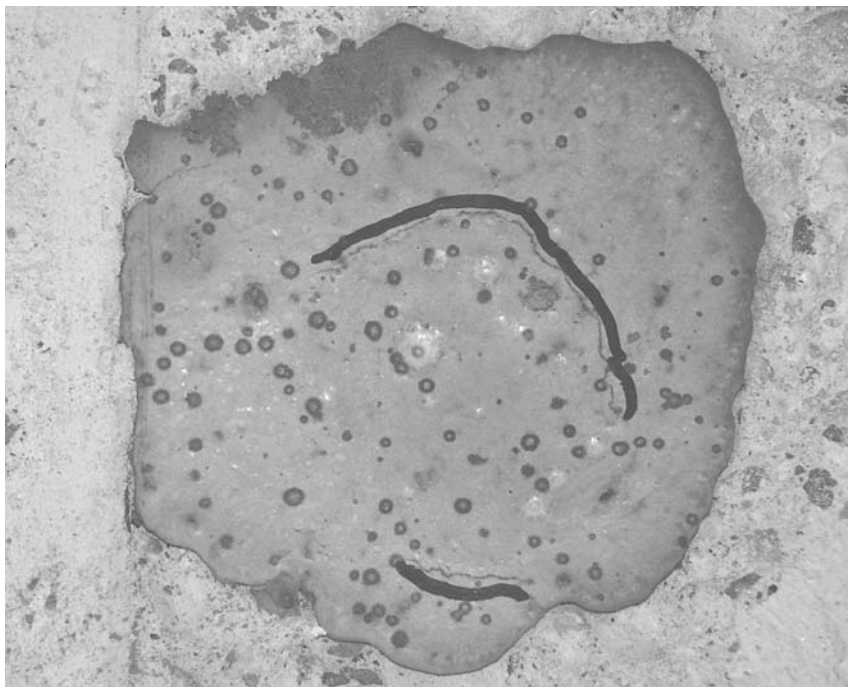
Grout on top surface of STWPL02 test with shrinkage cracks.
